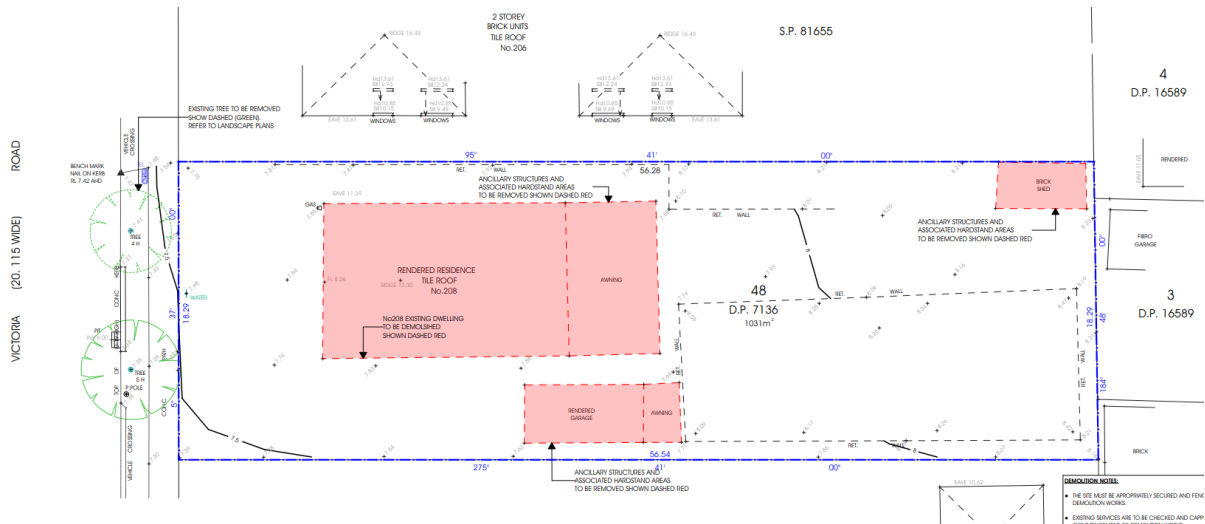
Extract of demolition plan of subject site (208 Victoria Road, Punchbowl) (Source: Design Building Group, 2023).
